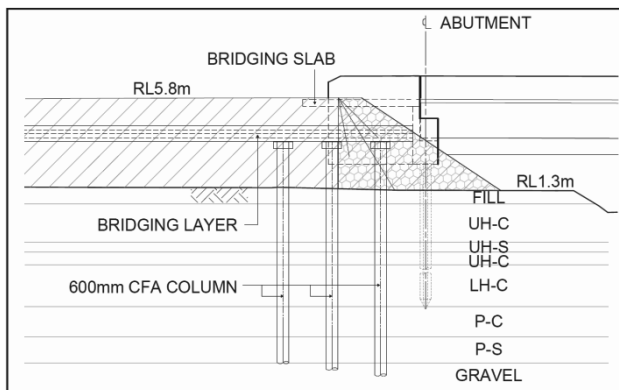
Typical operational stage bridge approach transition design arrangement proposed during Stage 1
